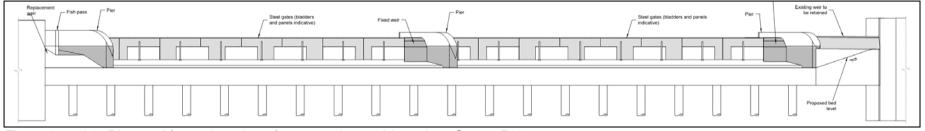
and 3: Plan and front elevation of proposed movable weir at Crown Point
